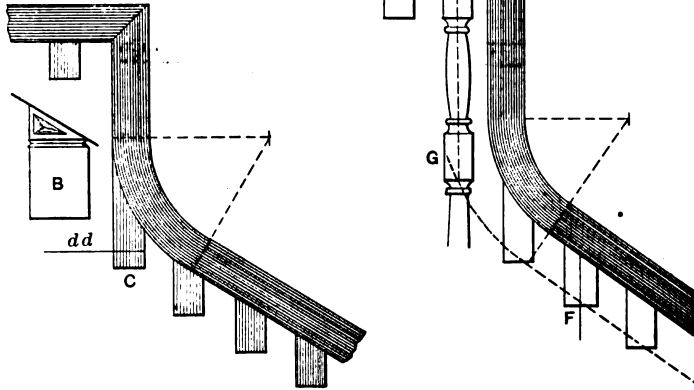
Showing the Heel or Short Side. Fig. 2—Showing the Center Line to be Used.
